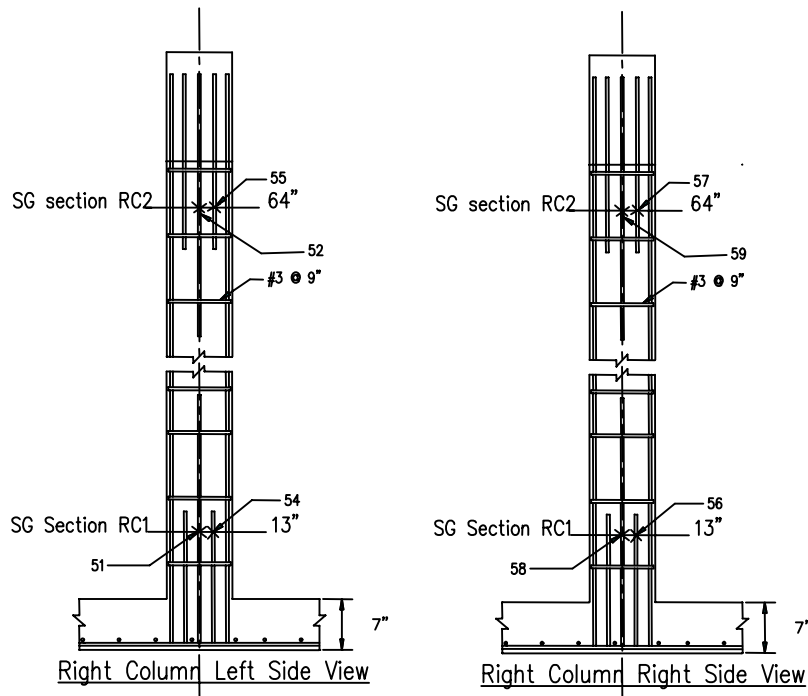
Steel details and Gage Locations for the Right Column in B2SA
